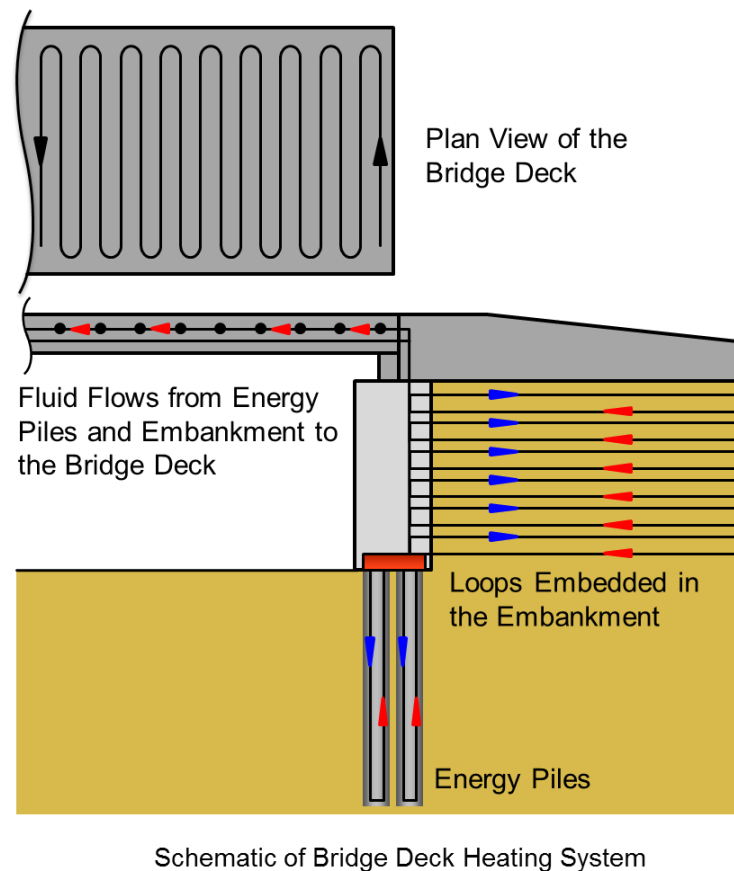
Conceptual schematic of ground-source bridge deck deicing (redrawn after Bowers and Olgun 2014).
